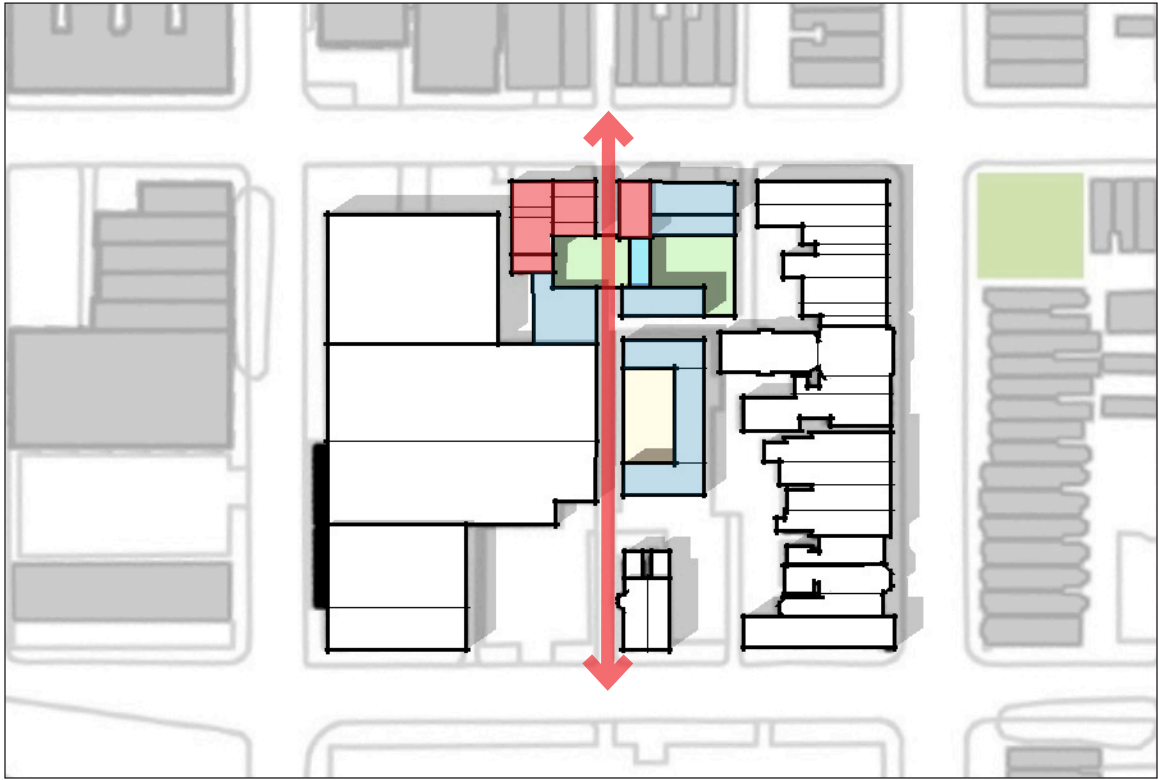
Plan showing existing (in red) and proposed (in blue) (Author)
